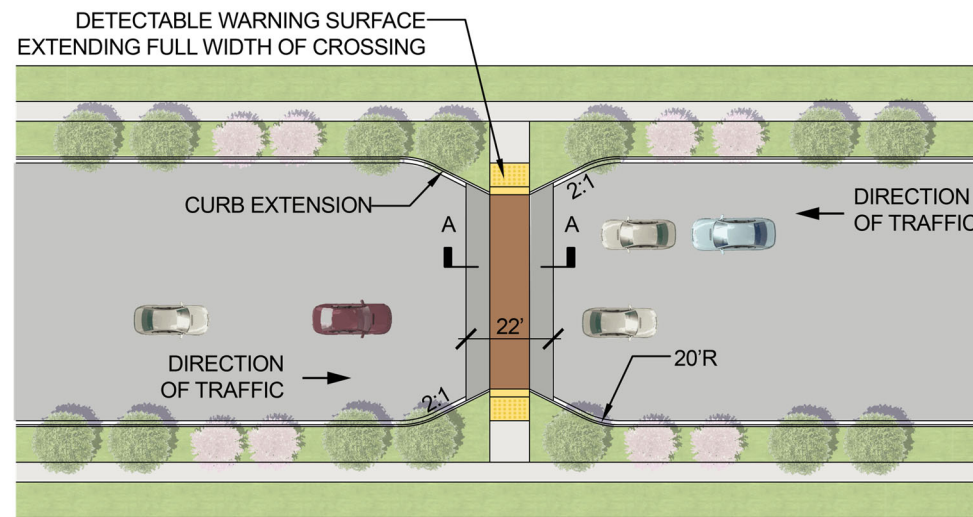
RAISED CROSSWALK PLAN VIEW
